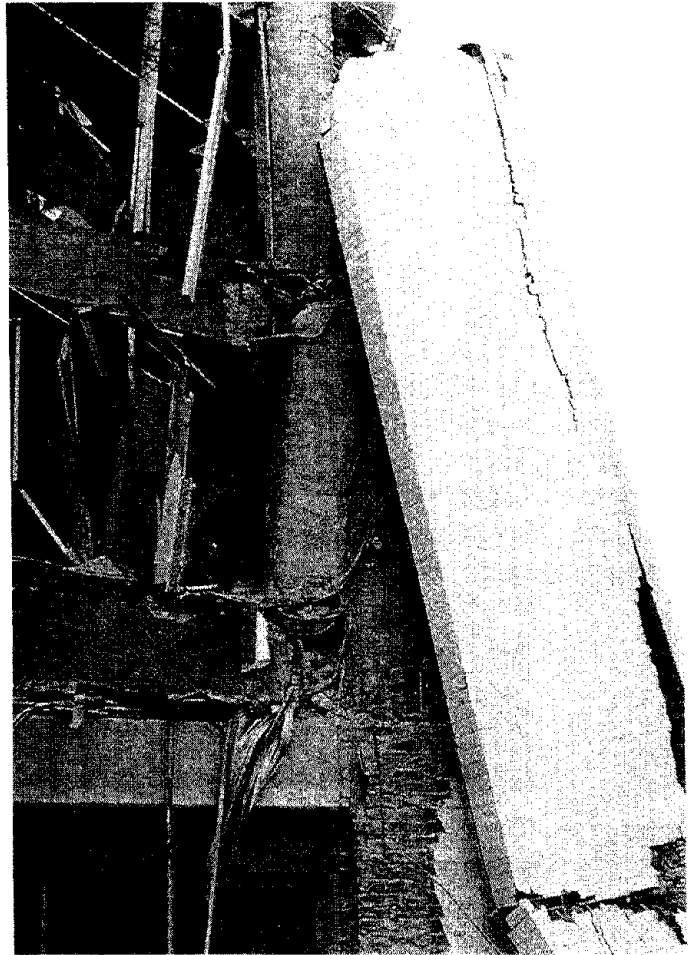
The stiff infill panels of the Barrington Building effectively shortened the concrete columns, forcing all the displacement into the column sections bounded by windows. Diagonal X-cracking decreased in severity towards the top of the building.
